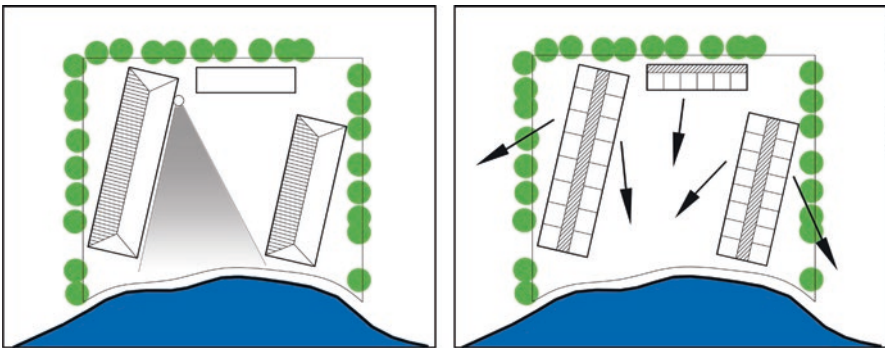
Building orientation along a diagonal access will maximize units' views (left). A double-loaded corridor will also offer a view to dwellings on either side (right)
